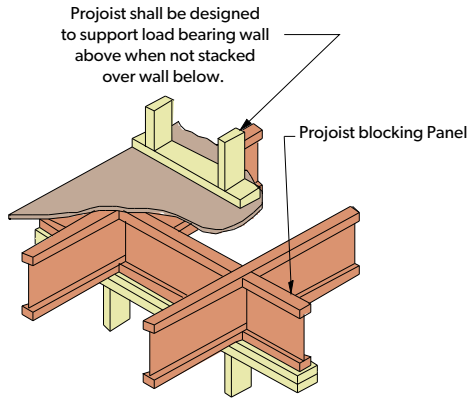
INTERIOR LOAD BEARING AND BRACING WALLS.
